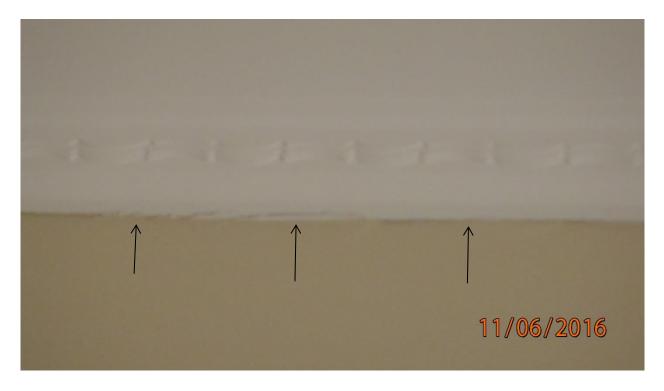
shows a crack to the mitre joint of the cornice in the north western corner and separation cracking at the wall / cornice junction of Bedroom 1
